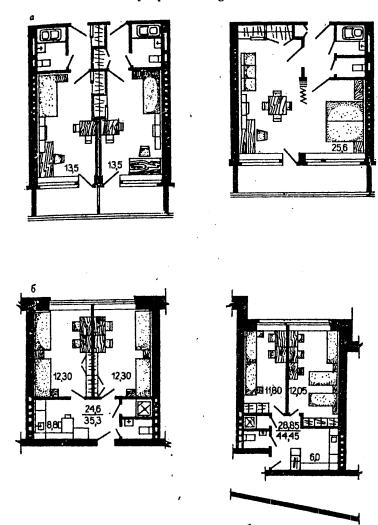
Layouts of living quarters (a); rooms for 2-3 people (b) in corridor apartment houses.
